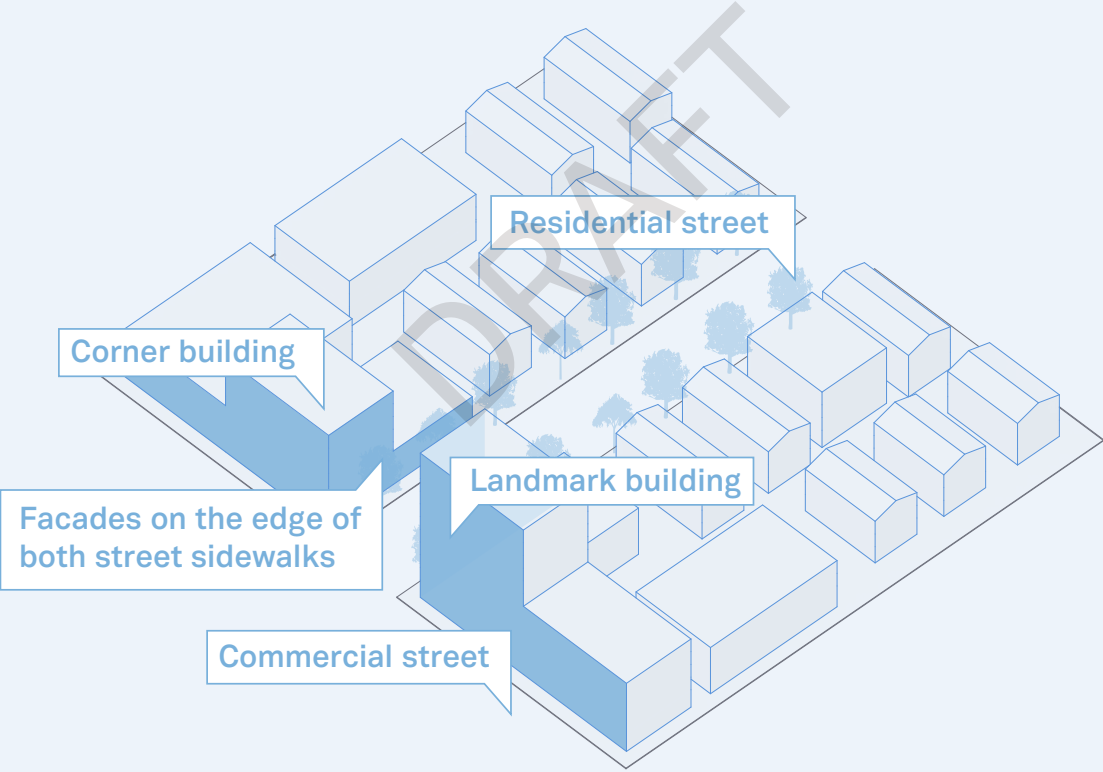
Buildings at the corner of commercial and residential streets should have facades on both streets.
